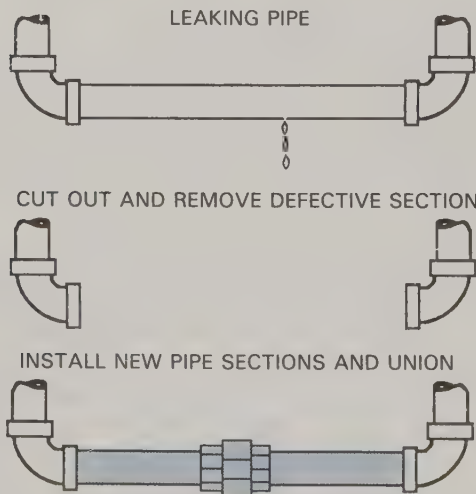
Steel pipe can be repaired by cutting out the defective section, then replacing it with two new lengths of pipe and a union.
